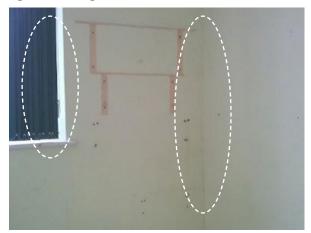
Photograph showing window reveal and external wall to partition wall junction next to Office 5
